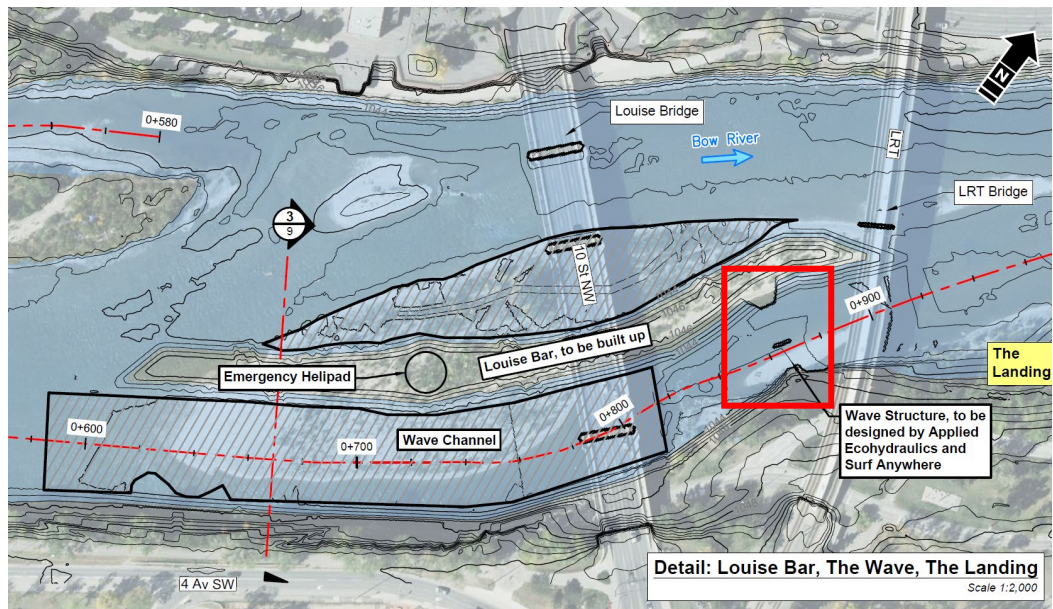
Adjustable wave structure channels and pier in the Site Plan and Digital Elevation Model. Rom Appendix C: Preliminary Hydrotechnical Design Report)
